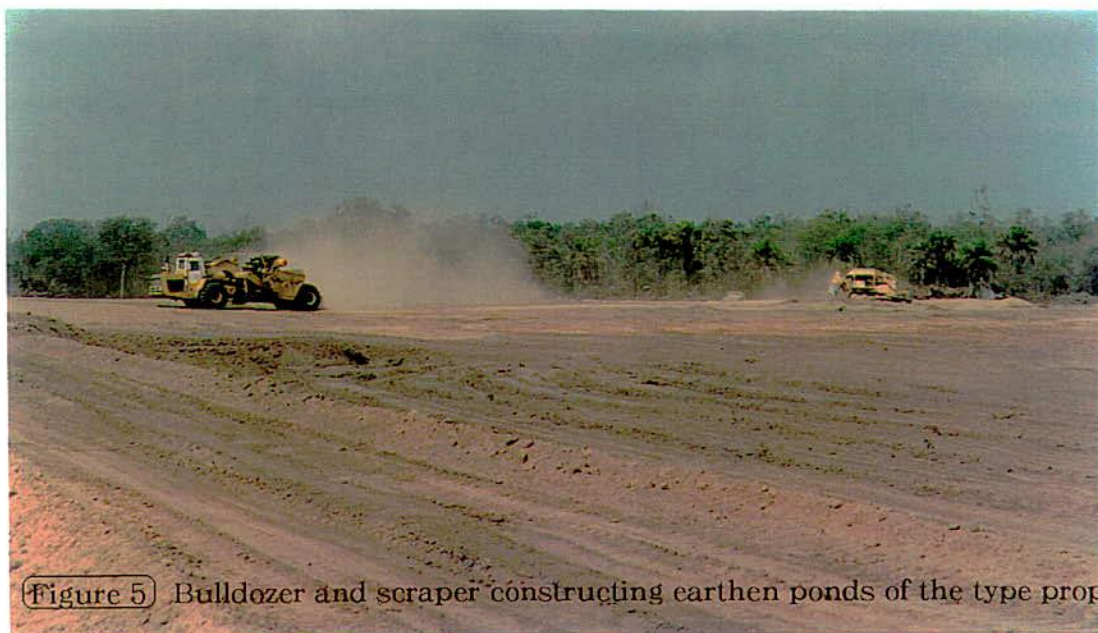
Bulldozer and scraper constructing earthen ponds of the type proposed.
